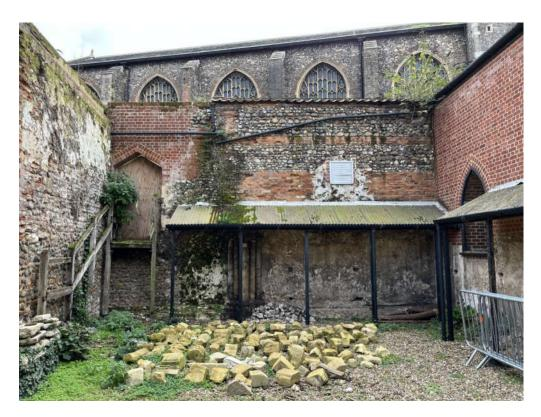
Bowed and cracking window arch brickwork
